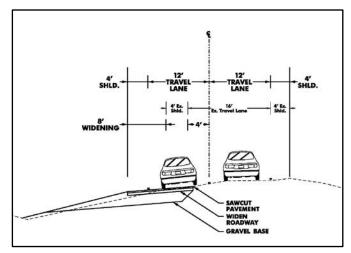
Cross-section of on-ramp showing existing and proposed conditions, looking east
